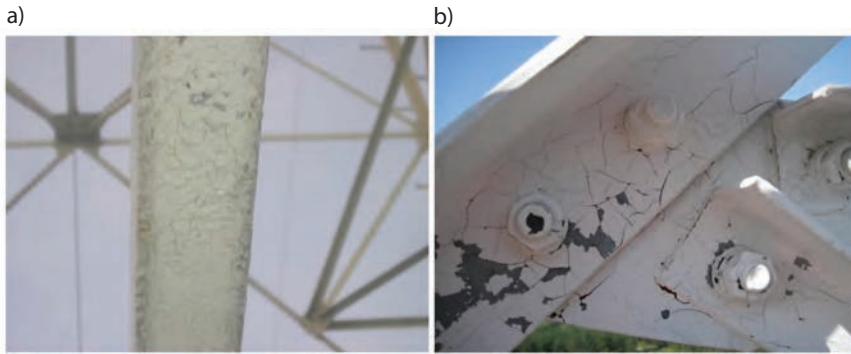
Defects of incompatible coatings: a) so-called crocodile skin effect, b) cracking and detachment of coatings
